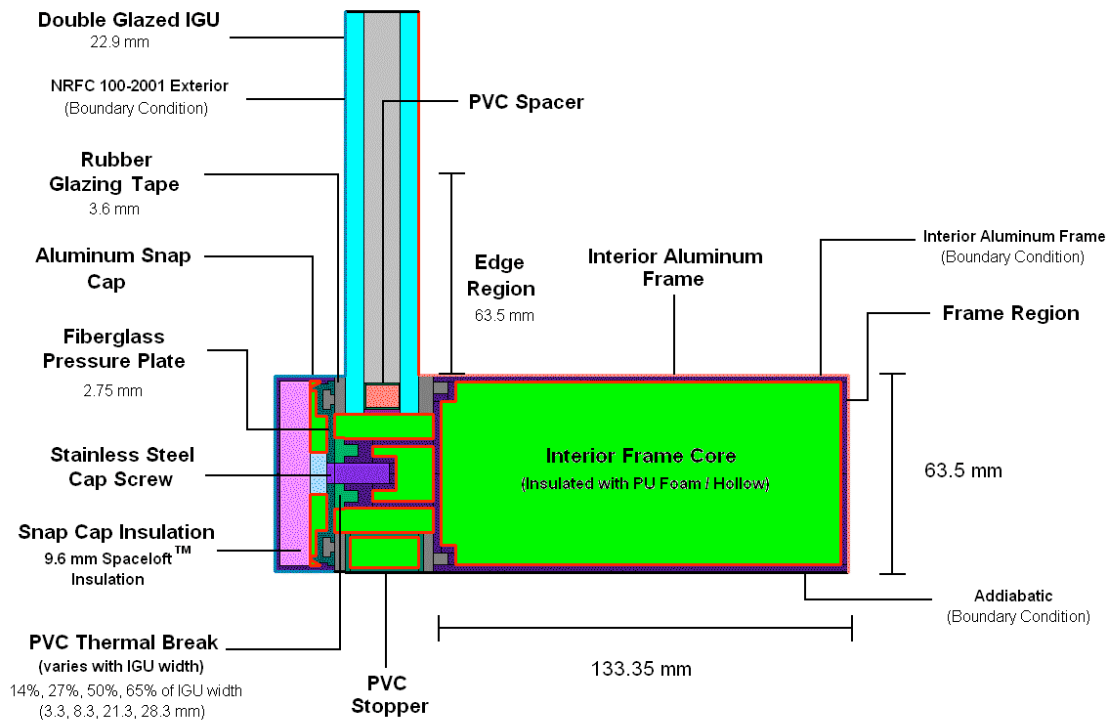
THERM6 (LBNL, 2008) model of aluminum curtain wall section
